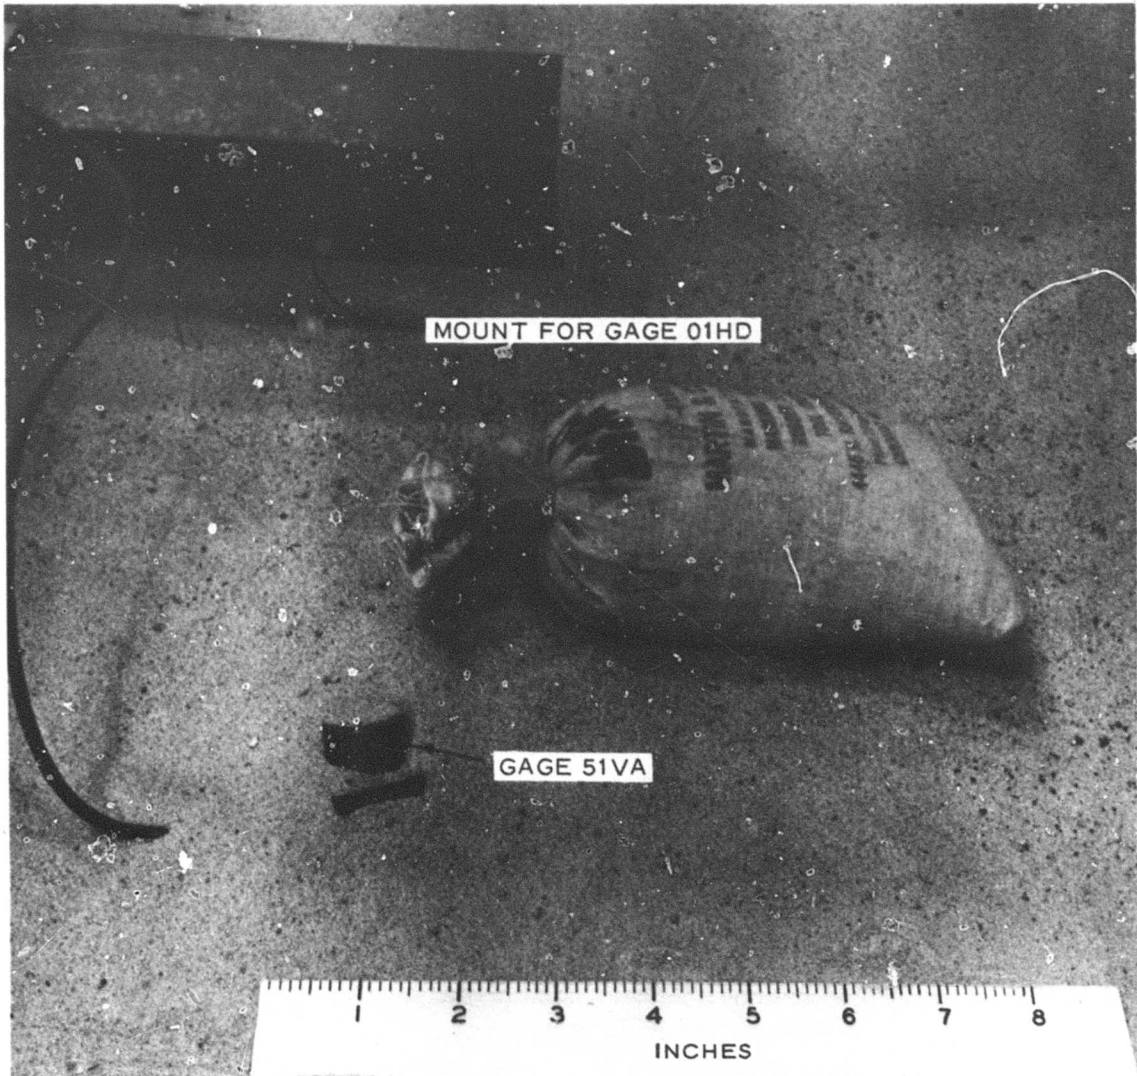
Dislocation of Gage 51VA caused by spalling of the interior floor during Shot 5.
